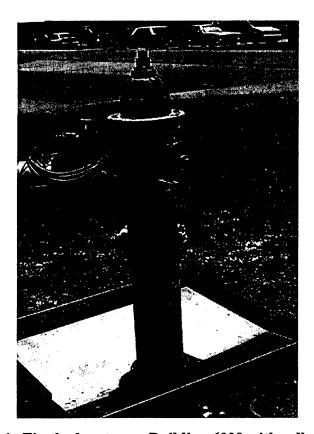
Fire hydrant near Building 6029 with collection pan.
